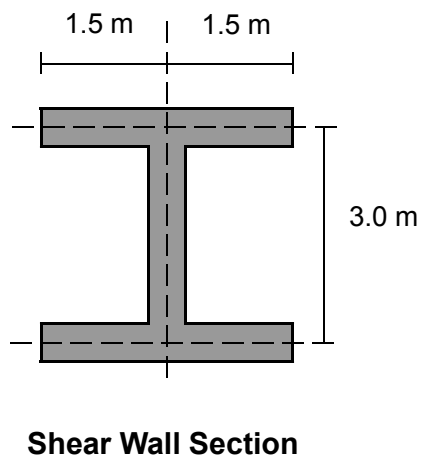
Plan of an H-Shaped Shear Wall Assembly and Its Proposed Model
